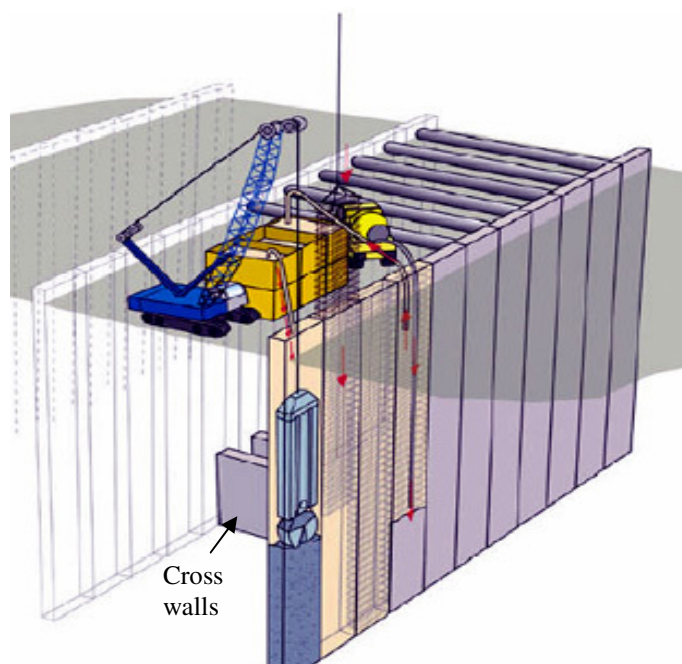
Installation of diaphragm walls with the slurry trench technique. [19]
